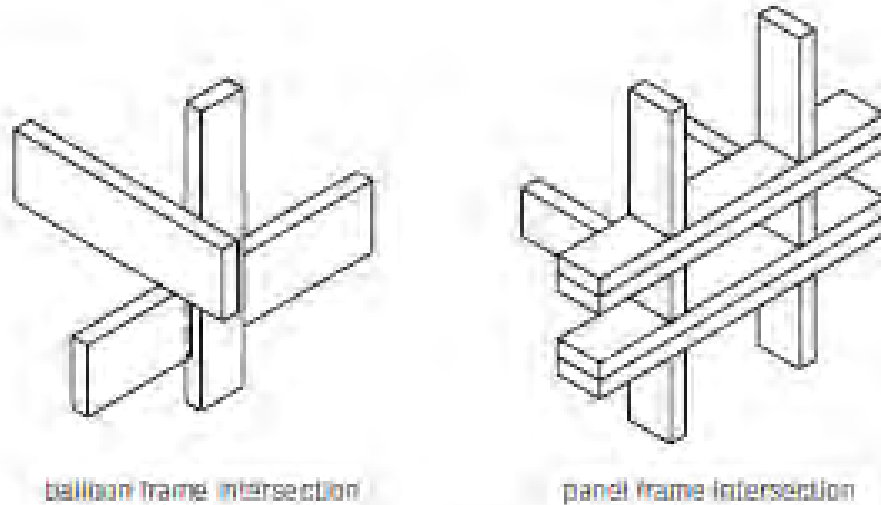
Isometric diagram of post-and-beam – timber-frame construction
